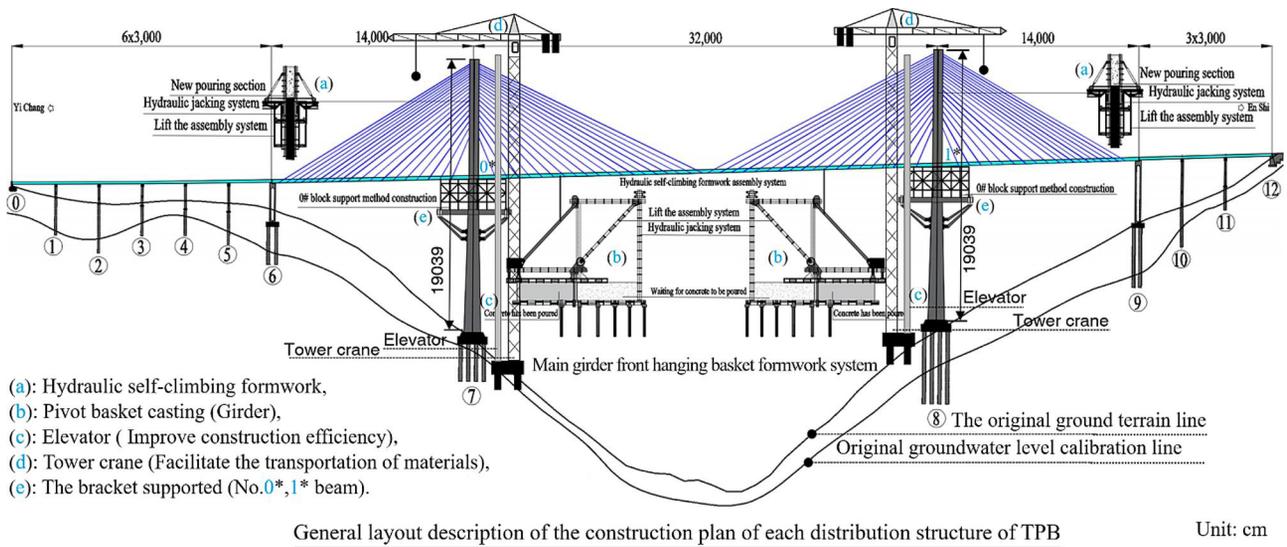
Facade display of Tie Luo Ping Bridge's large-scale equipment and construction machines
